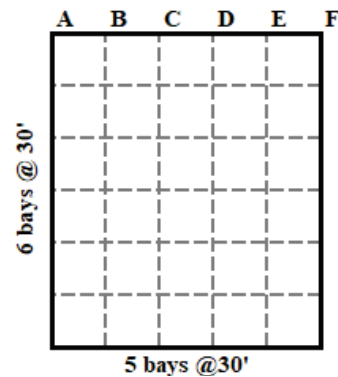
Baseline SDC D_{max} steel moment frame building typical 20-story plan.
